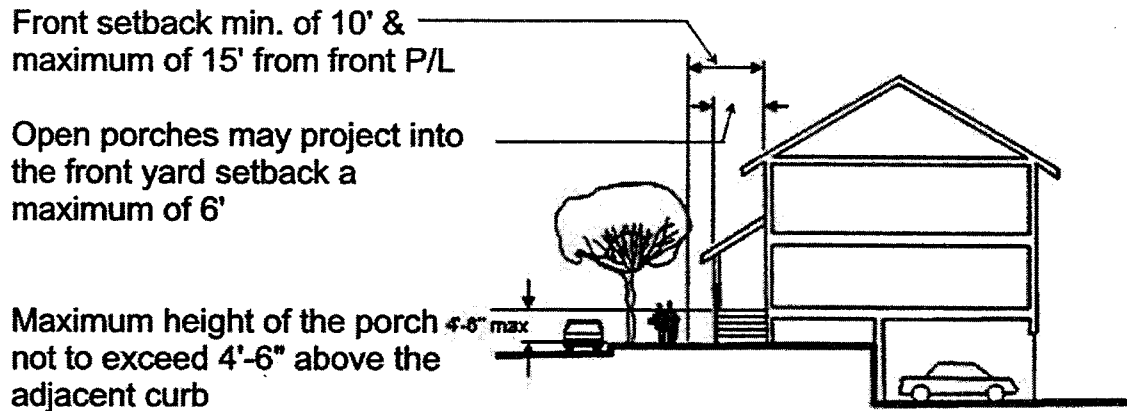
Village Center MDR Front Setback-Cross Sections
